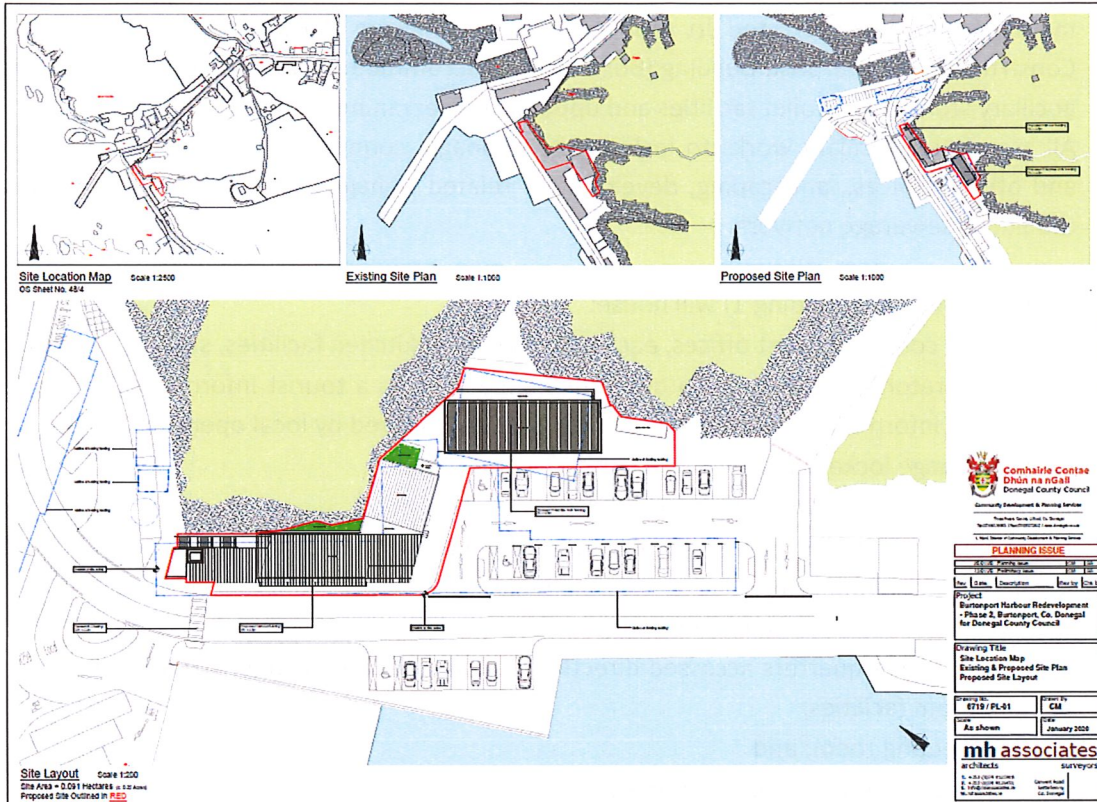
The proposed Harbour Building - Building 1 (published 23/01/2020)
